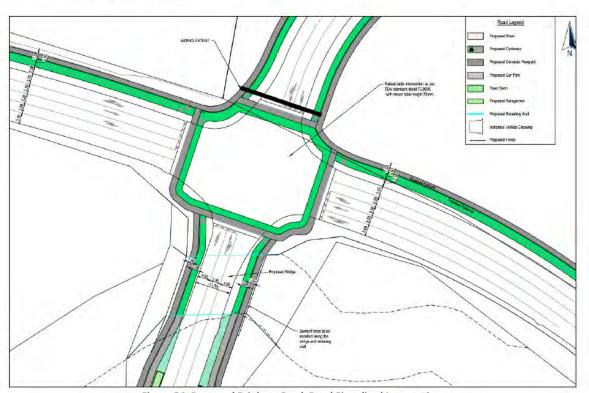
Proposed Brigham Creek Road Signalised Intersection
